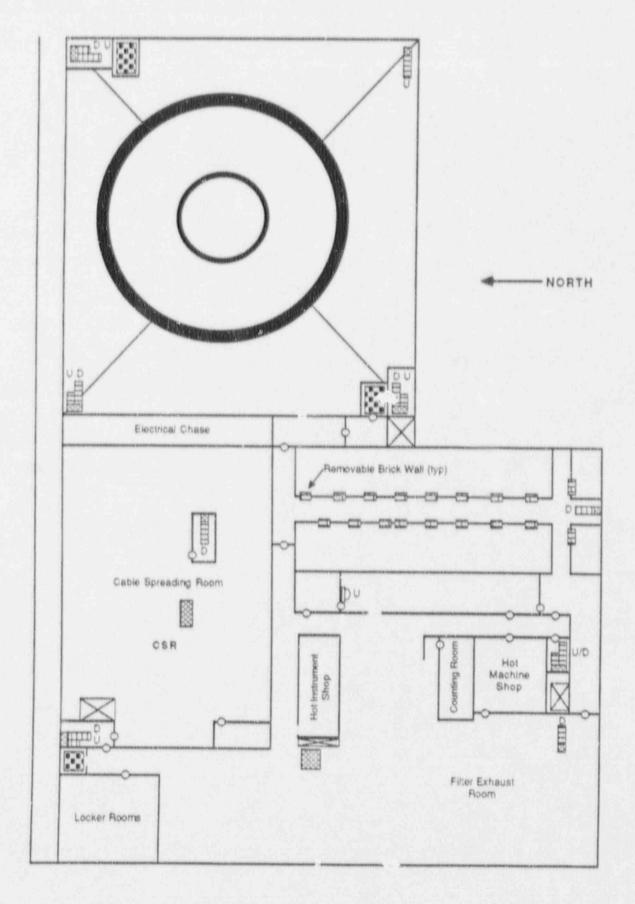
WNP-2 Reactor, Control and Radwaste Buildings Elevations 484' 0" and 487'0"
